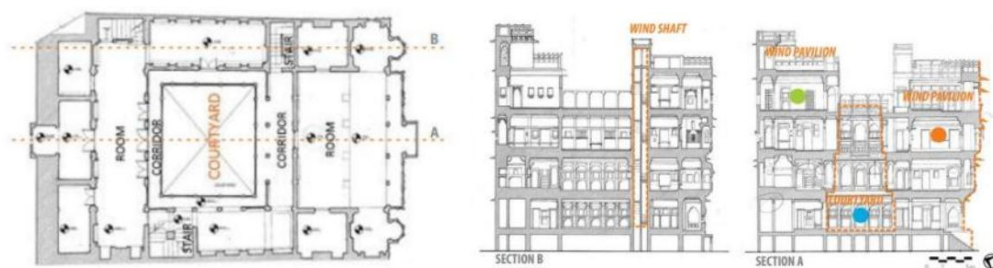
Plan of the havelis Figure 14: Sections showing wind pavilion and shaft
